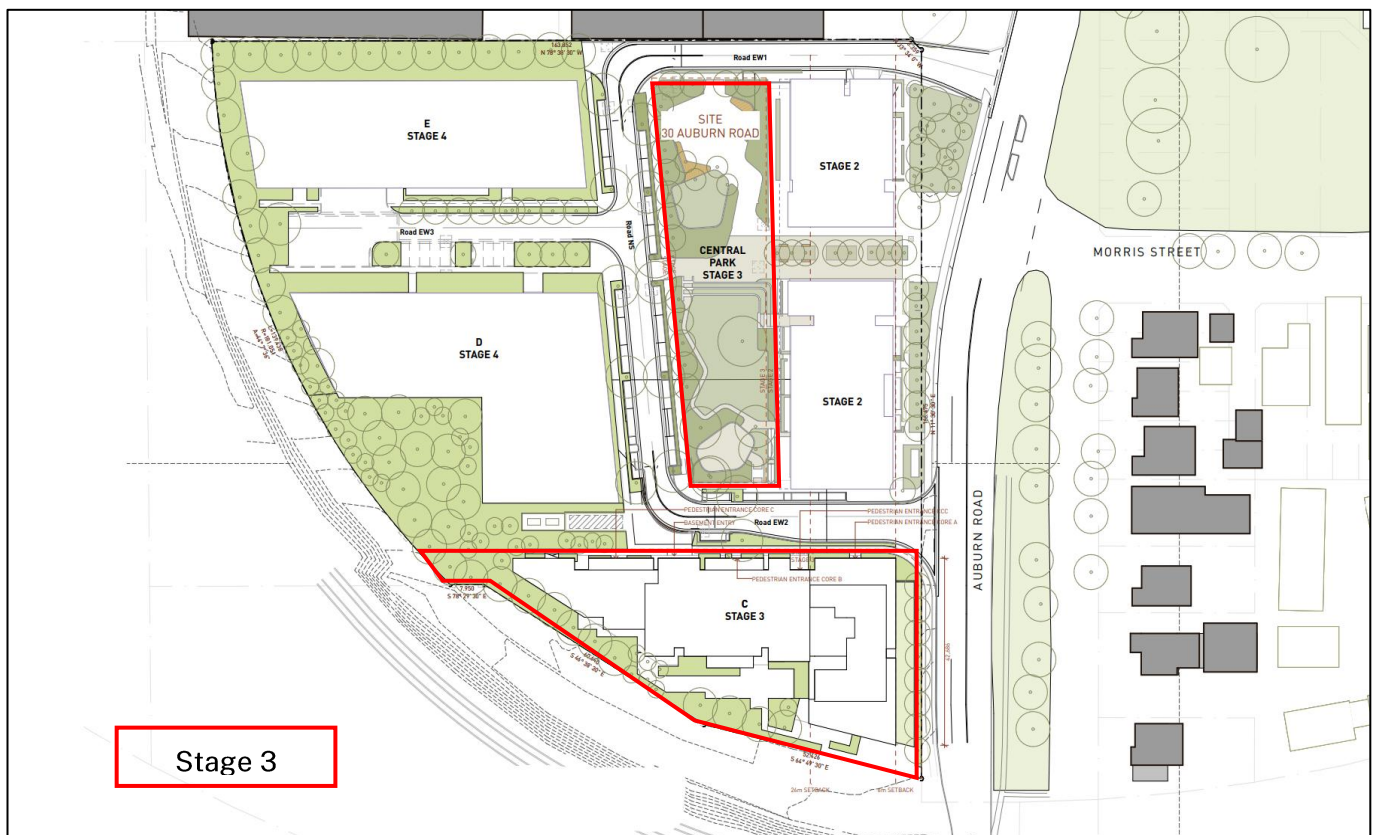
| Site layout (Source: Smith & Tzannes, 2026)
